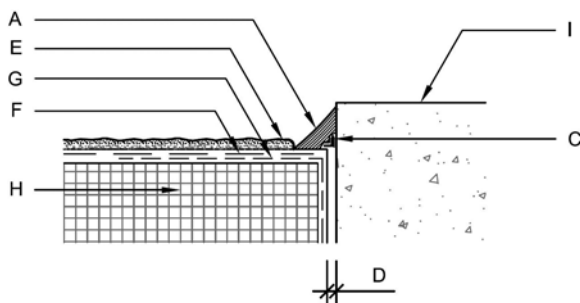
Sealant Fillet Joint Seal With Bond Breaker
